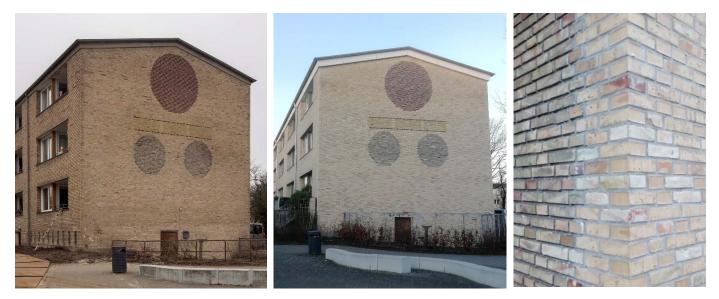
Tingbjerg: Original brick detailing at gable (left) and restored brick detailing after gables were insulated (middle); transition between original wall and rebuilt gable wall (right)
